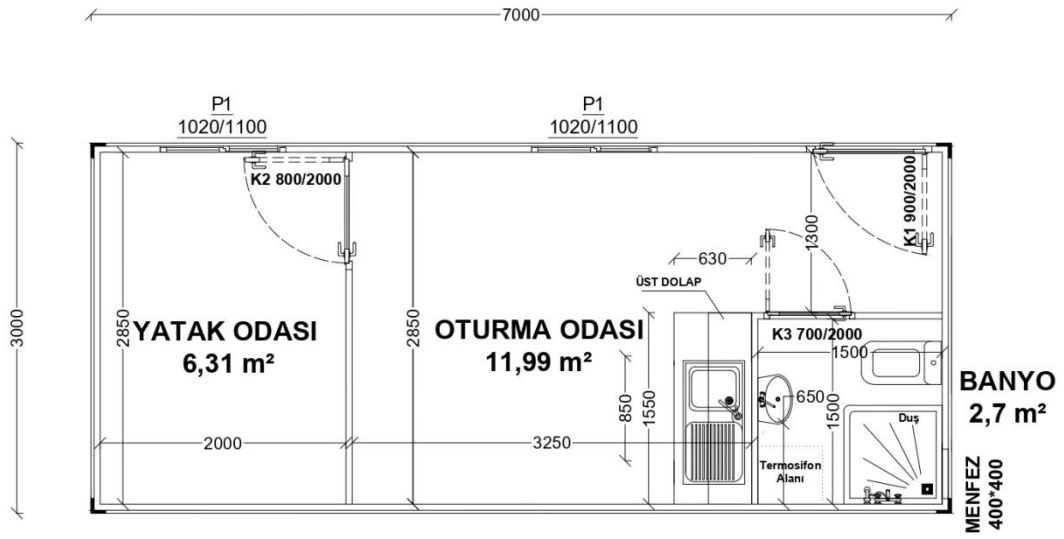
Bayraklı container city plan (Source: Izmir Disaster and Emergency Management Center Improvement Branch Directorate, 2023)
